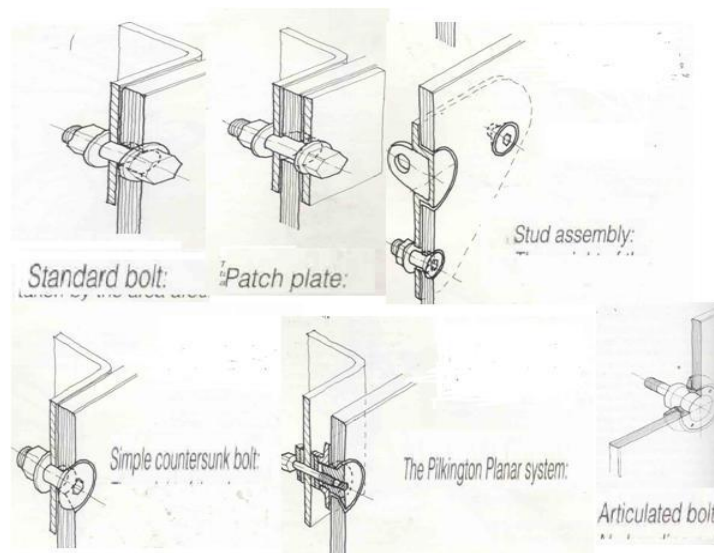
Curtain Wall Connections (Peter. R., and Dutton. H., 1995).
